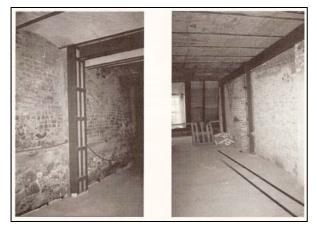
Steel frame structure substituting R.C. jacketing in a six-storey building in Wroclaw (Poland)
